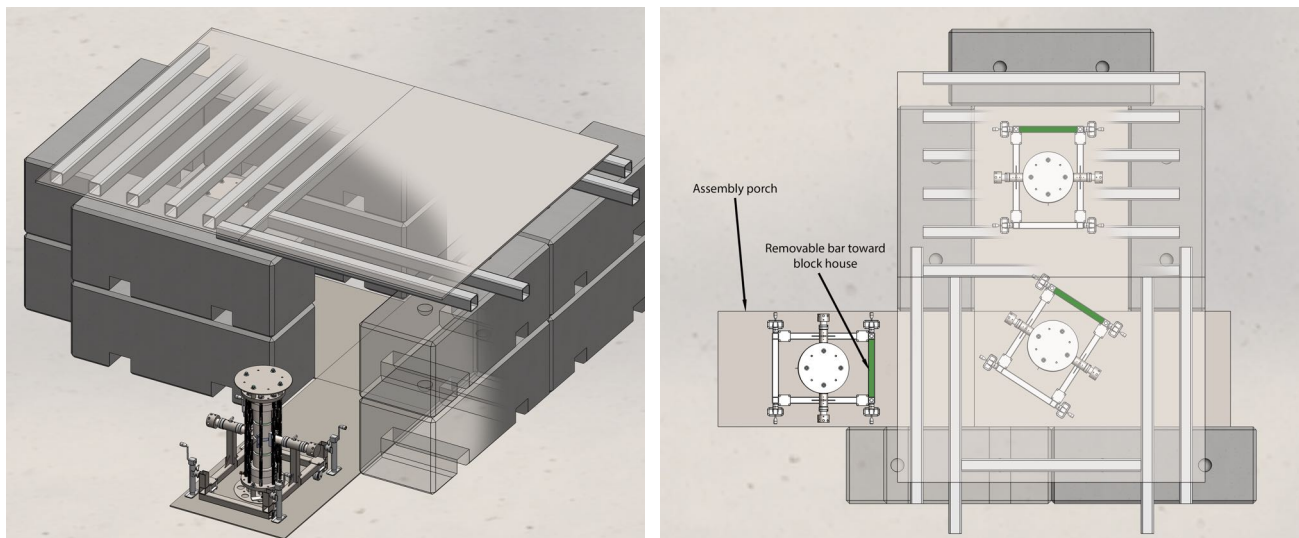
Firing site blockhouse in configuration with hallway entrance (shot assembly shown)
